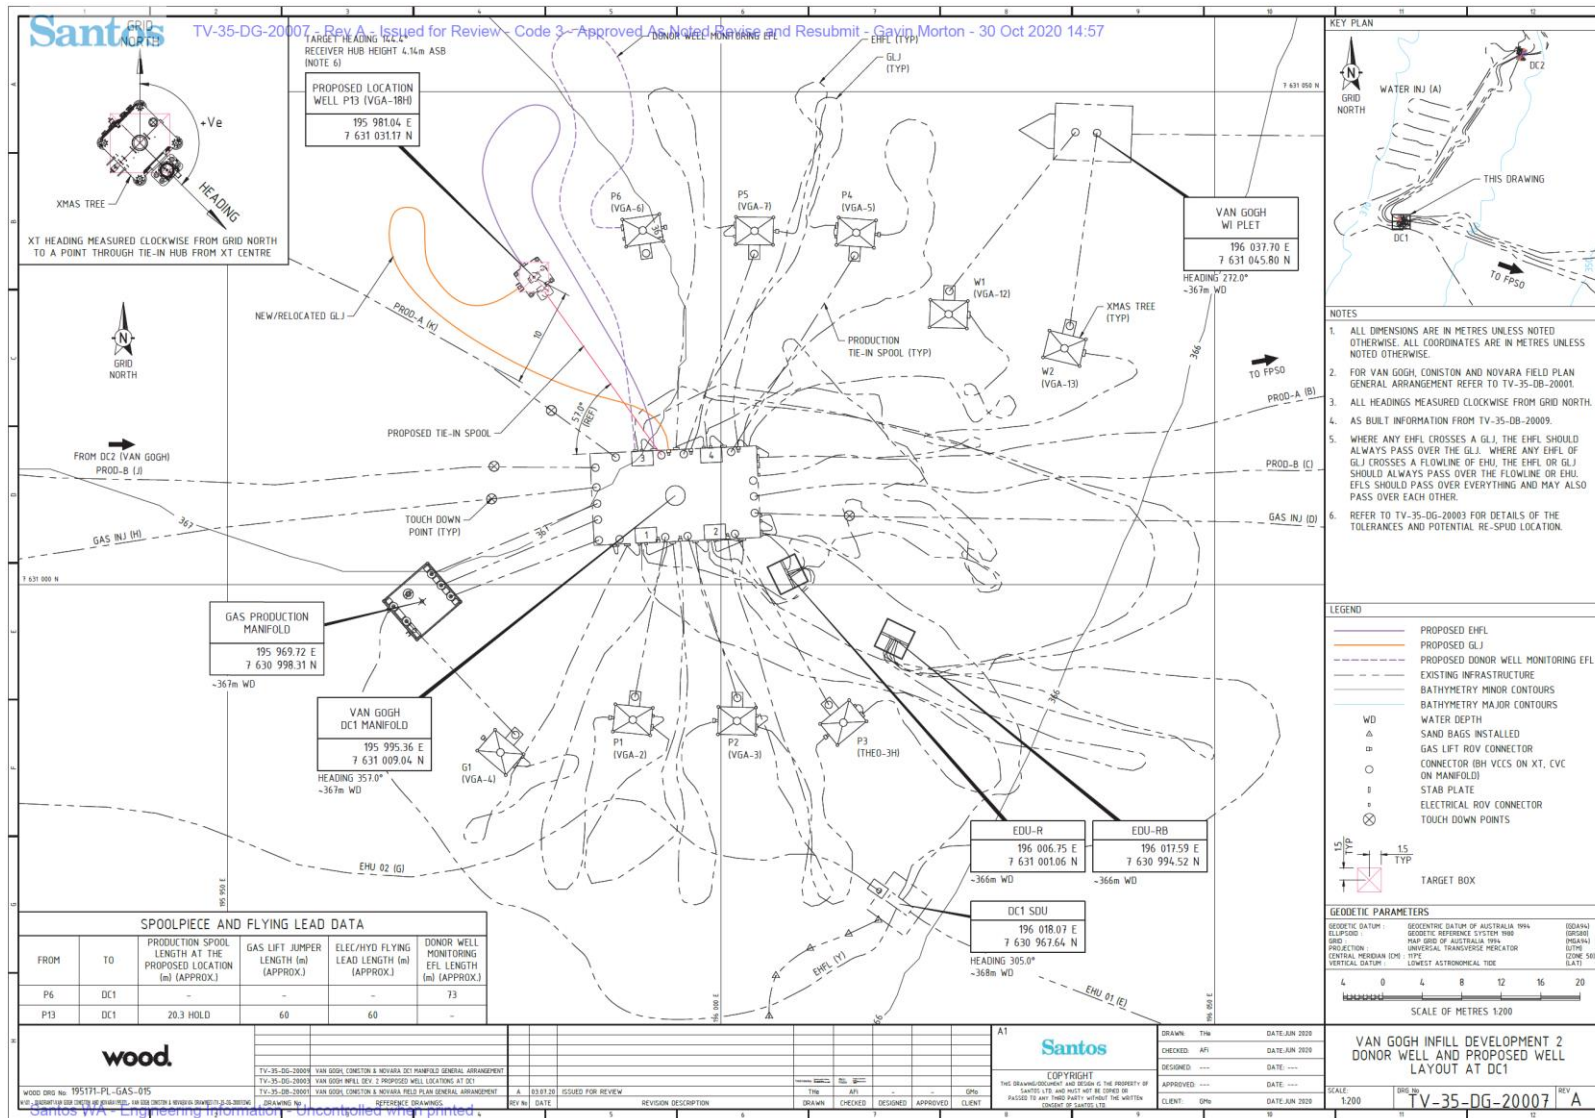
New infrastructure layout of the VGID2 installation DC1 manifold layout
